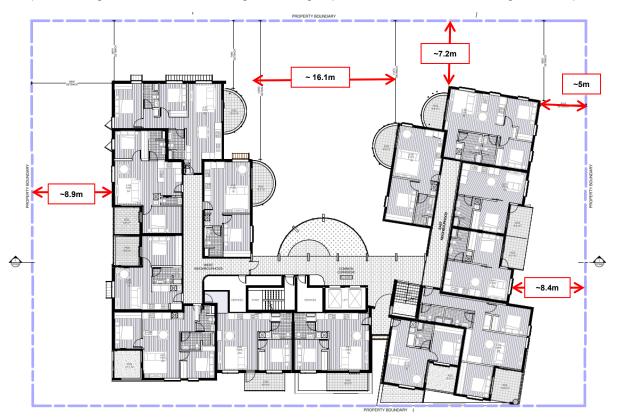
Extract of the typical upper level (5th storey) of the proposal showing the typical upper level setbacks and building to building separation
